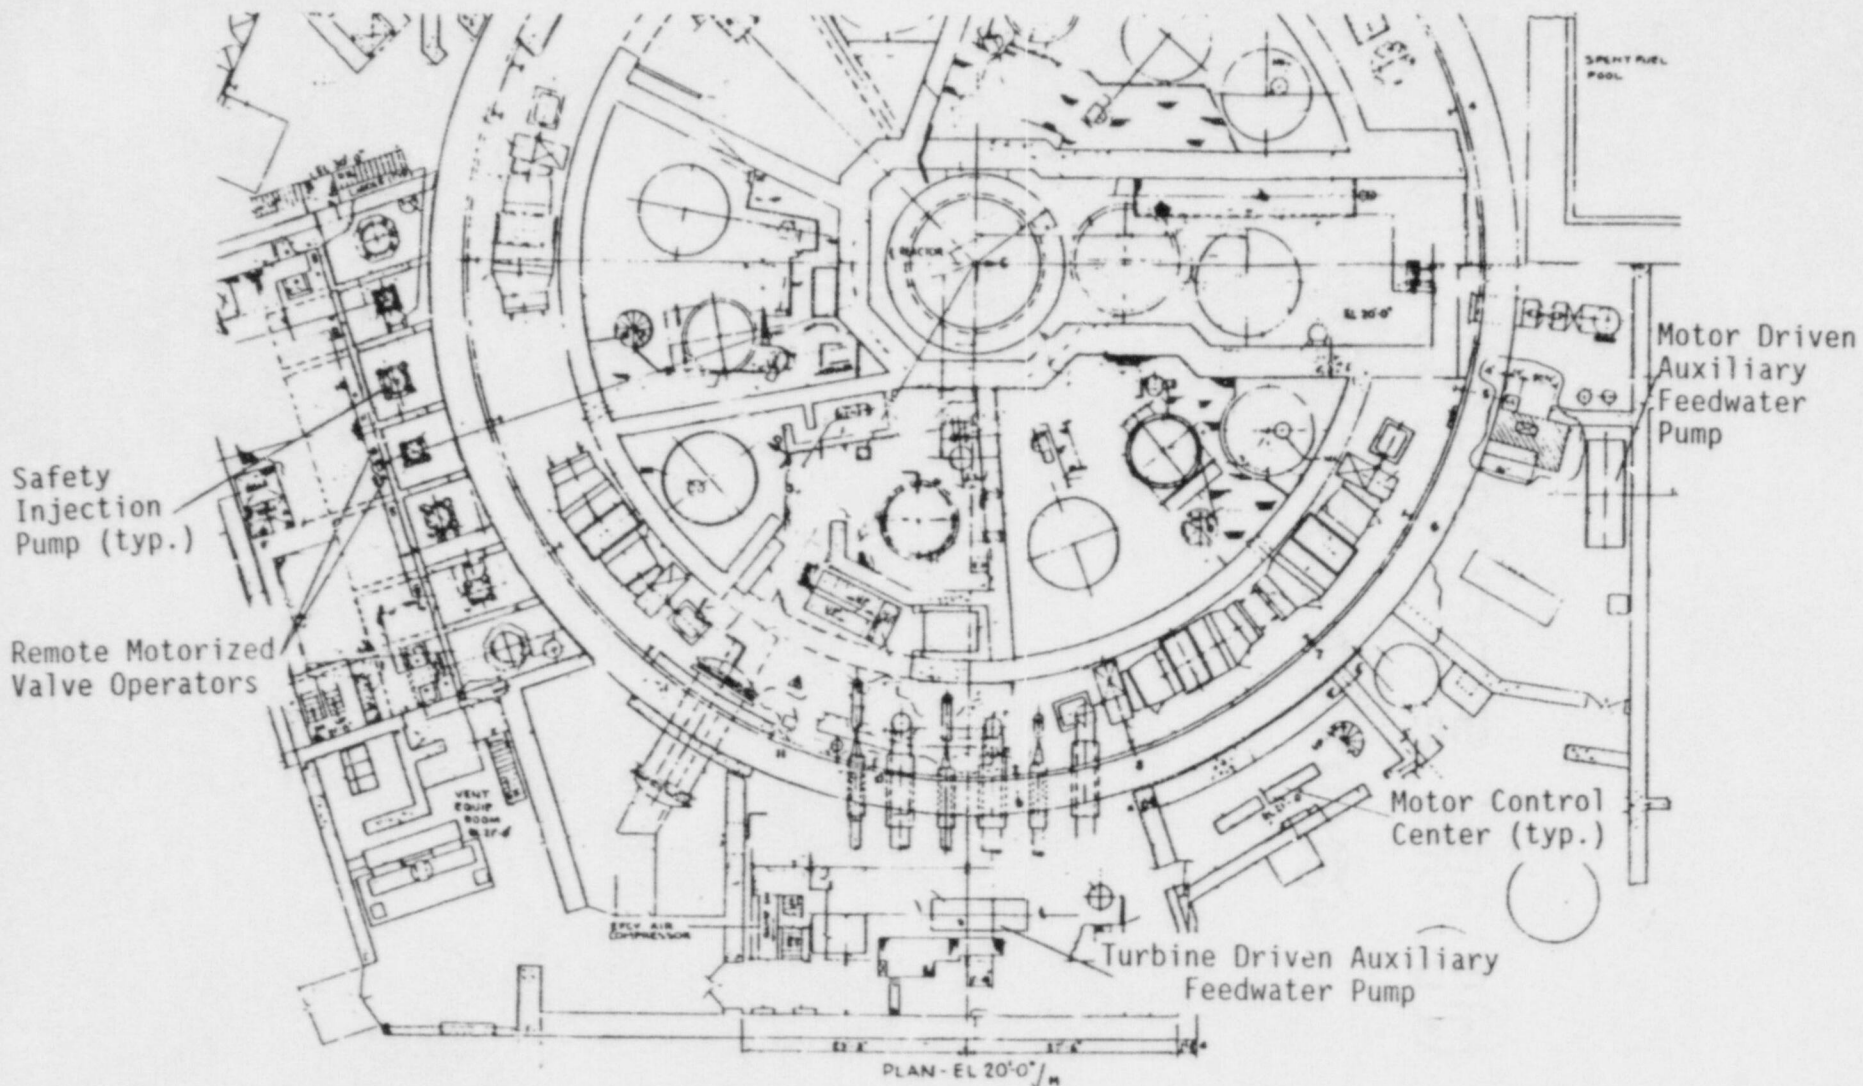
Plan of the Containment Building Showing Critical Equipment Locations.
